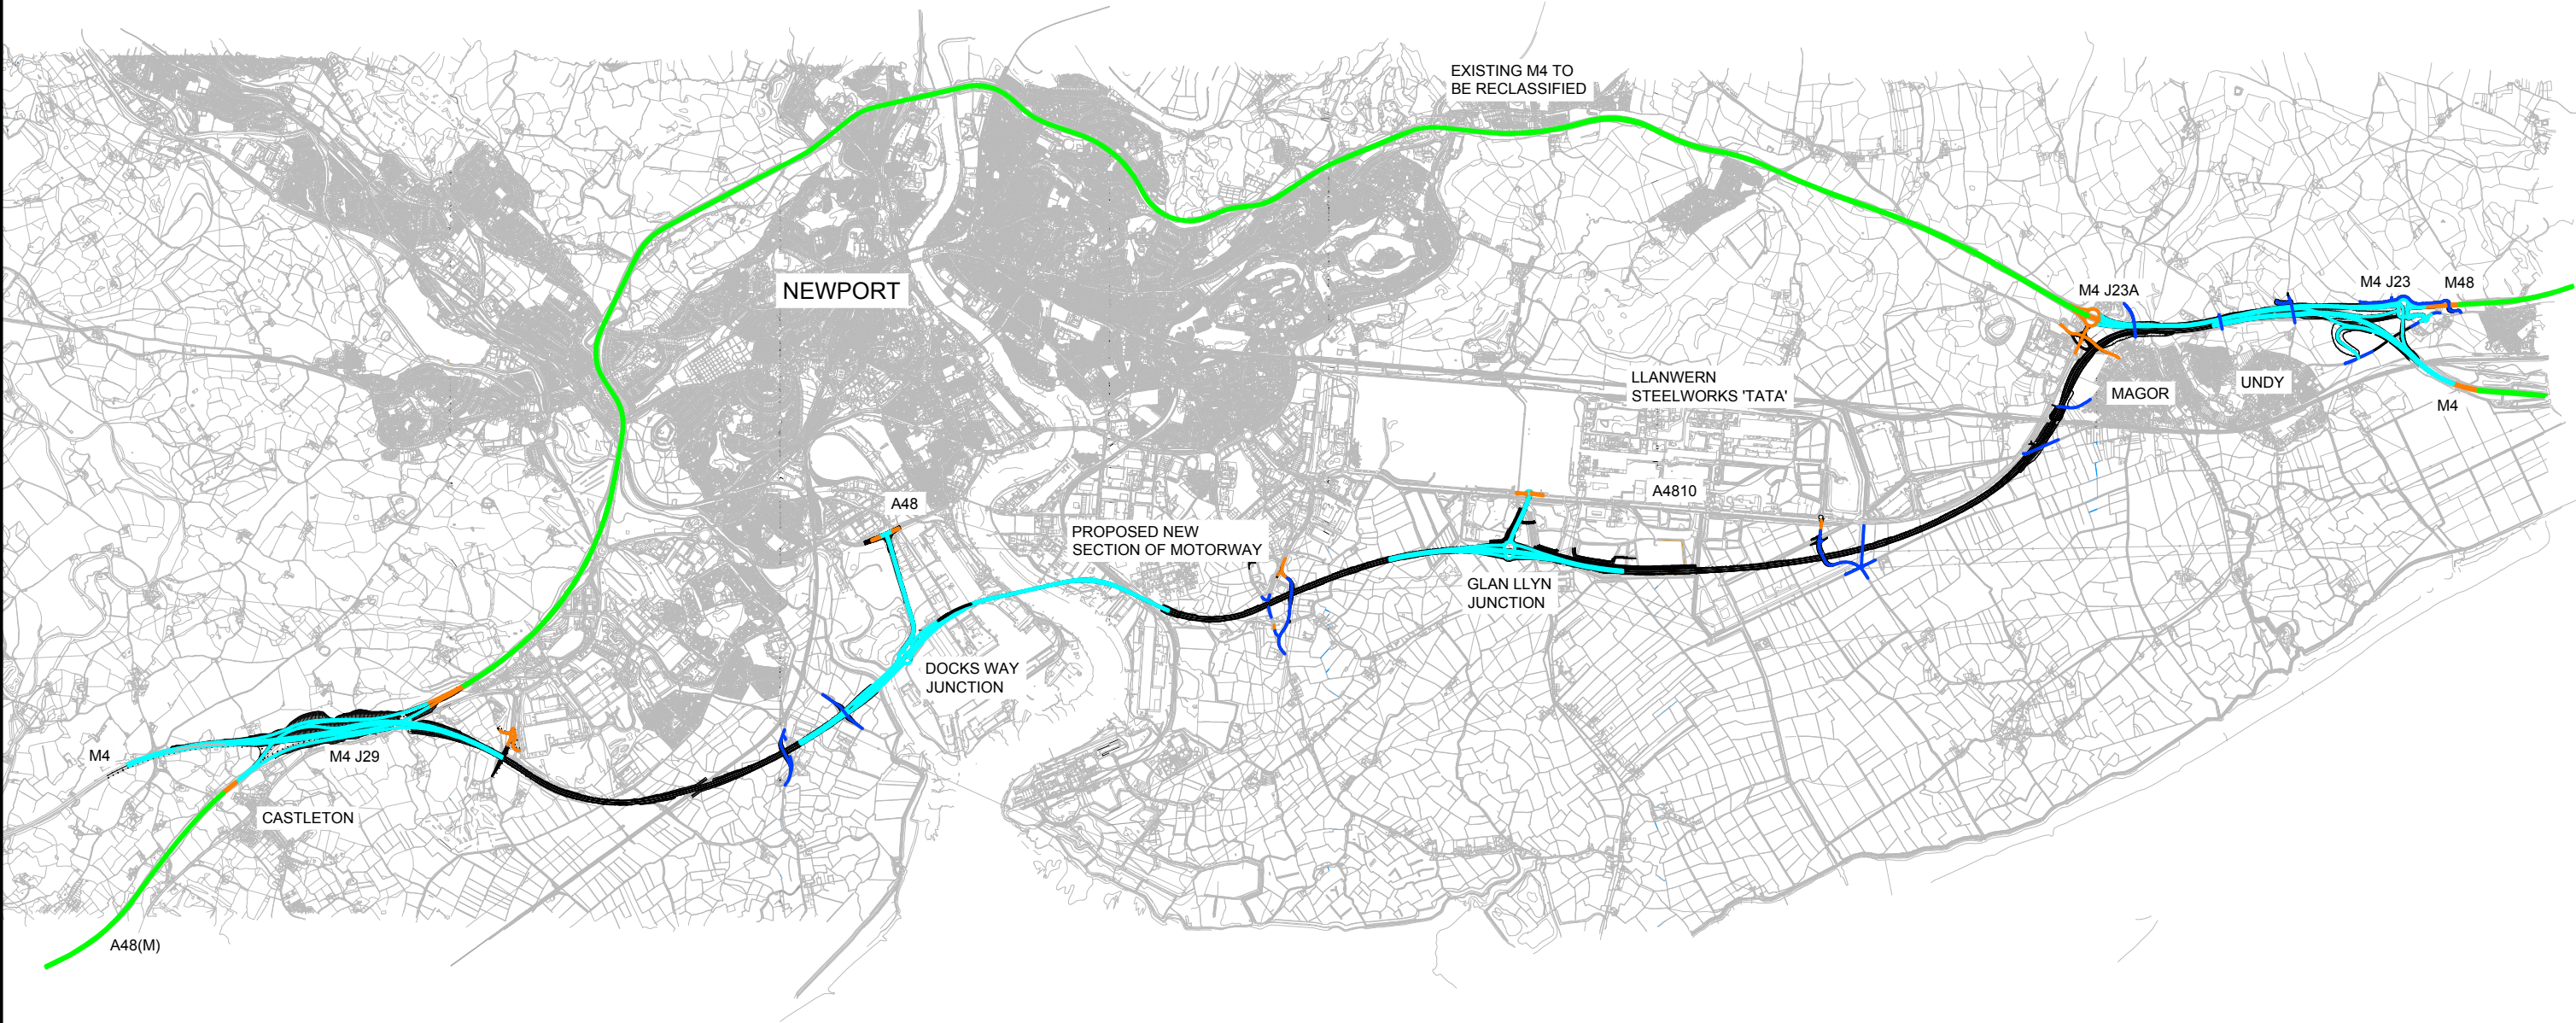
CaN-DJV-HGN-ZG-GEN-SK-CH-0045 – Existing and
